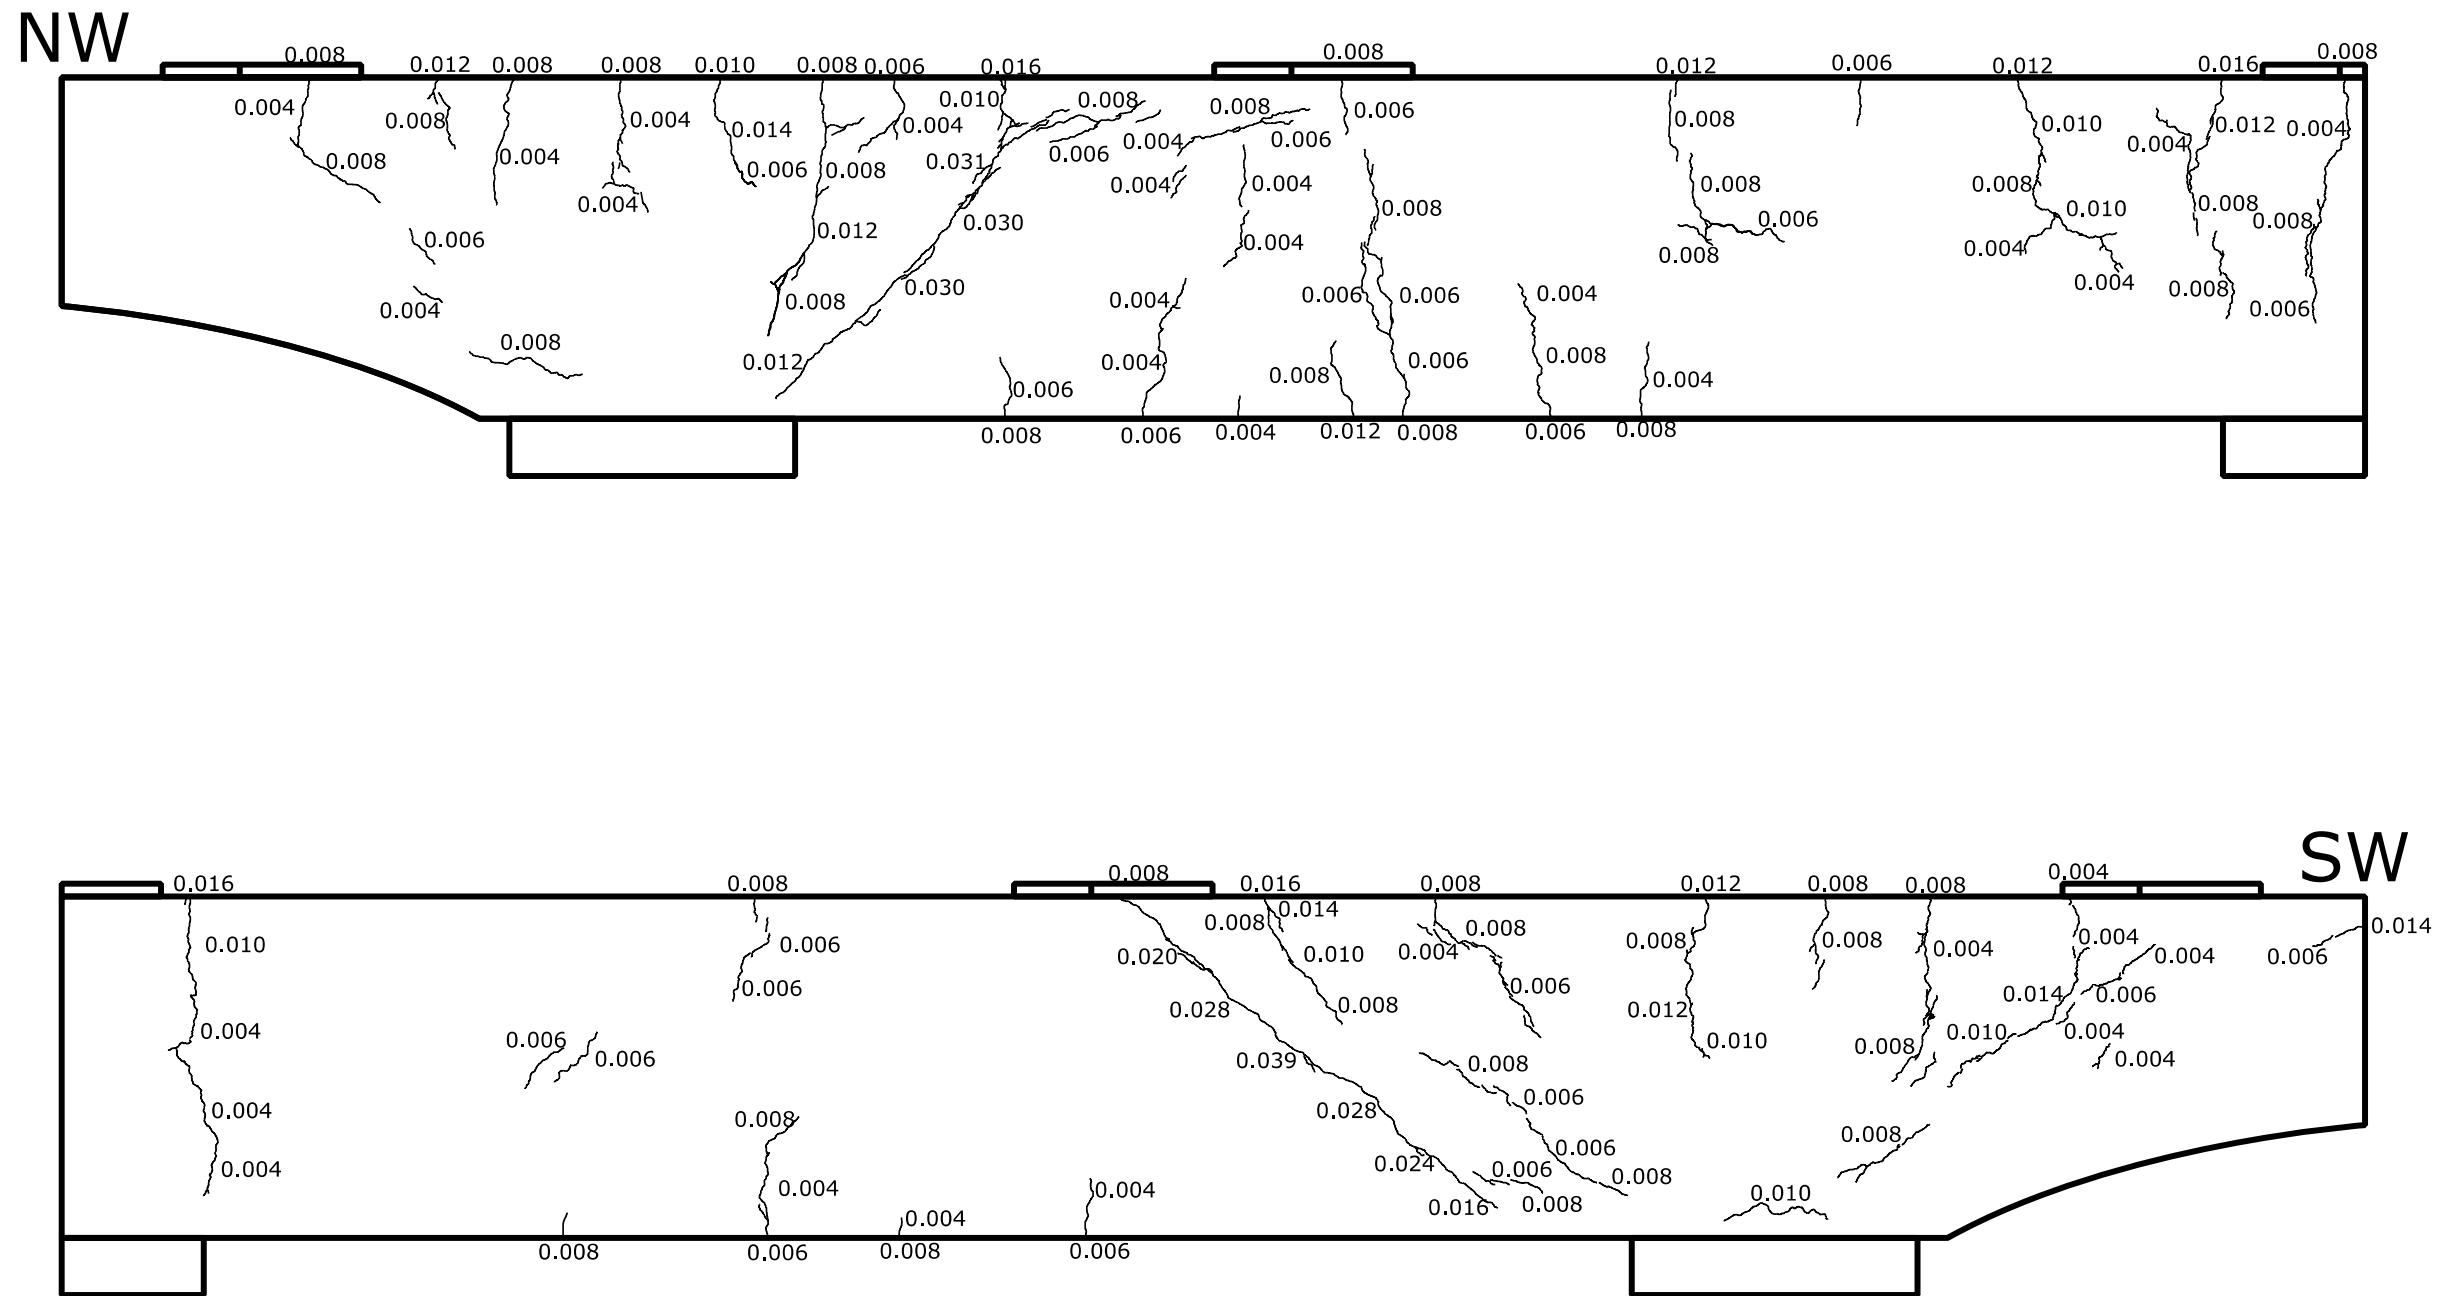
West face of BC1: cracking measured from laboratory inspection; crack widths reported using units of inches
